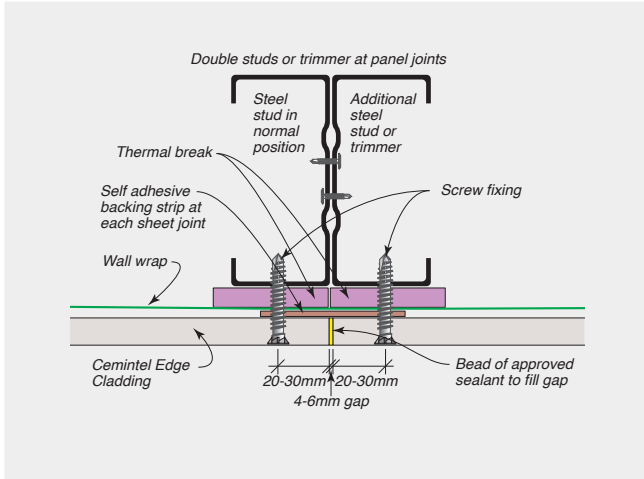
Typical Direct Fix Ribbon Cladding to steel stud – Horizontal Joint
